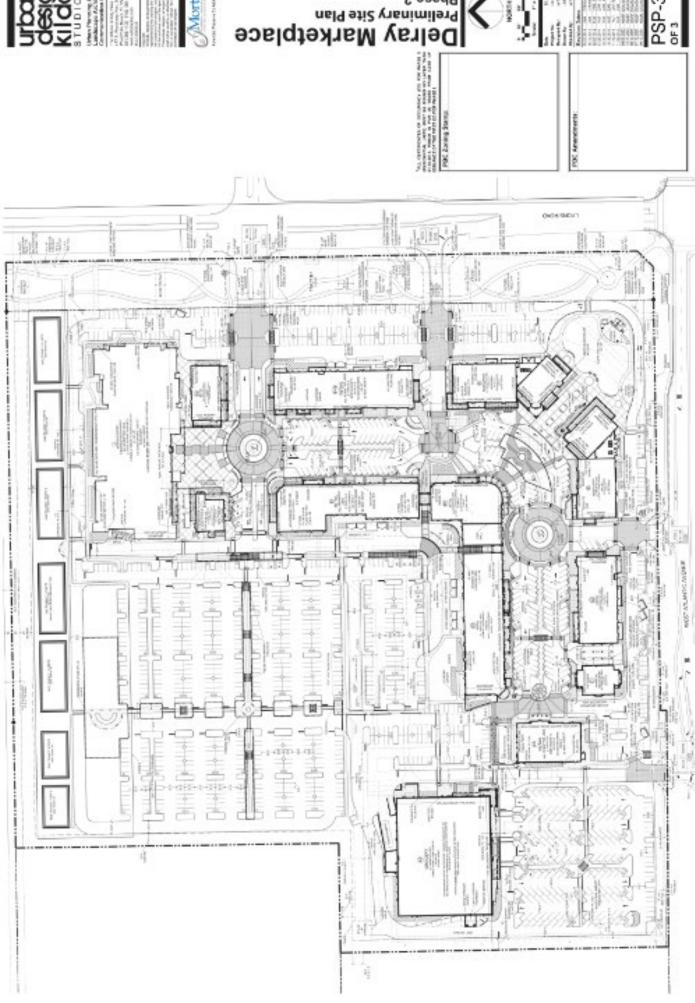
Preliminary Site Plan (PSP-1 of 3), dated October 12, 2021
